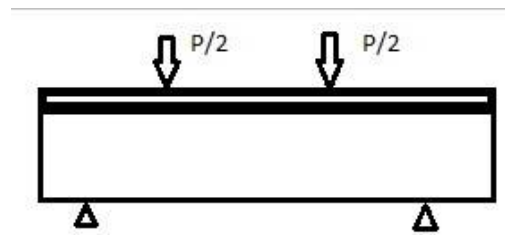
Upper layer steel fibre reinforced concrete 4 points bending tensile test
